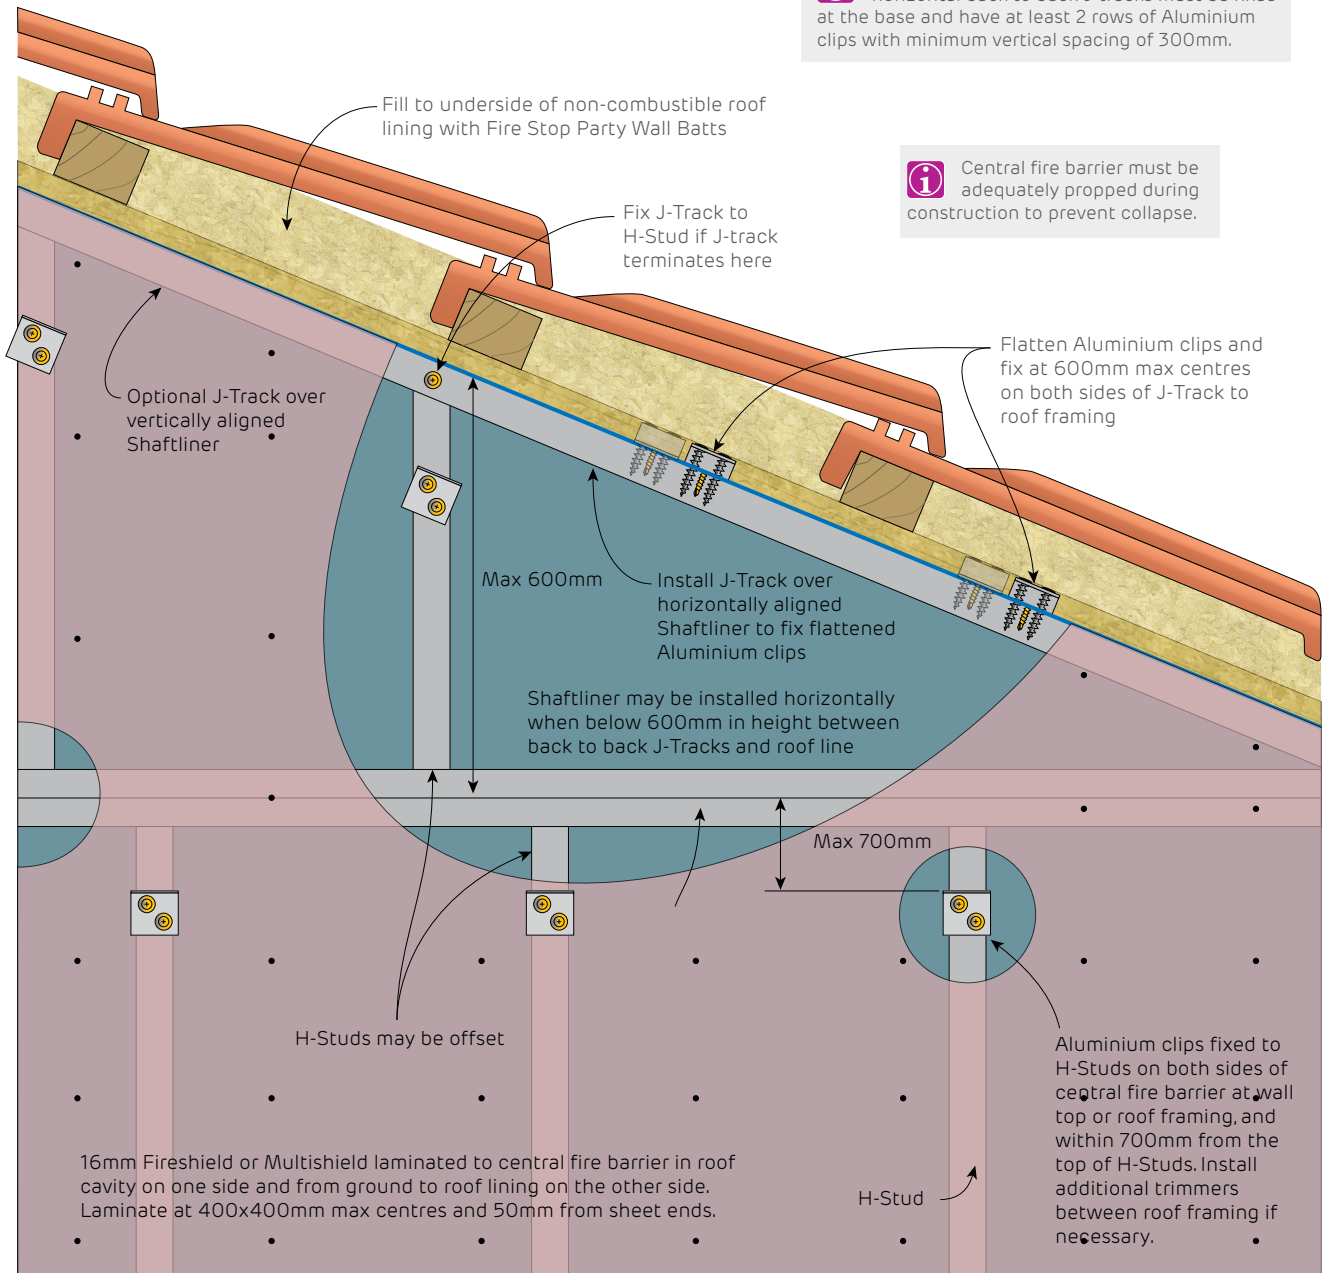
Interhome with Horizontal Shaftliner to Roof Line
